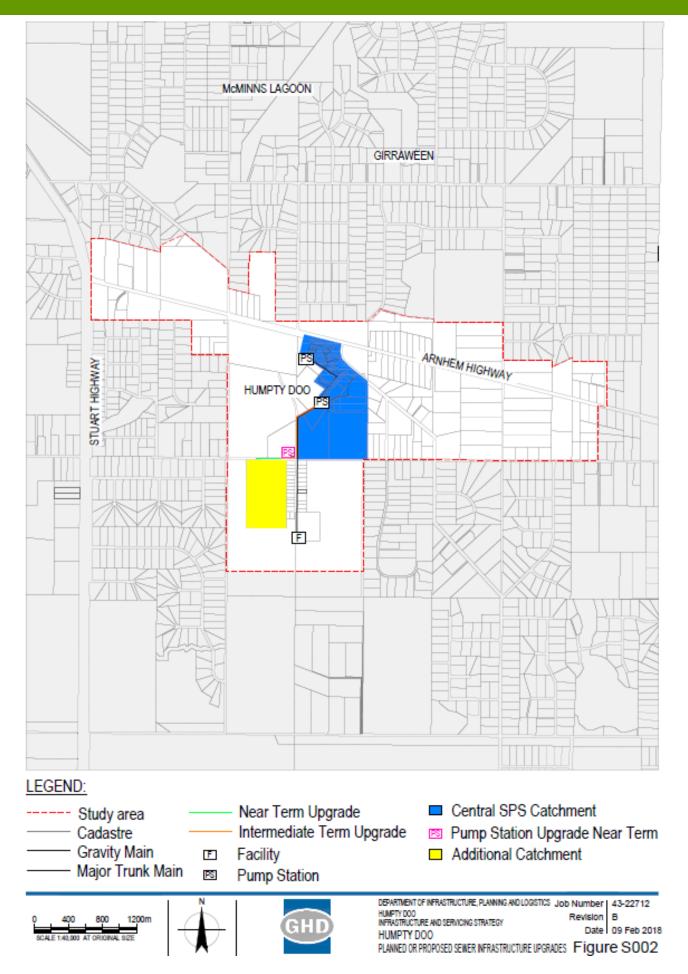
Existing and planned sewer infrastructure in the greater Humpty Doo area
